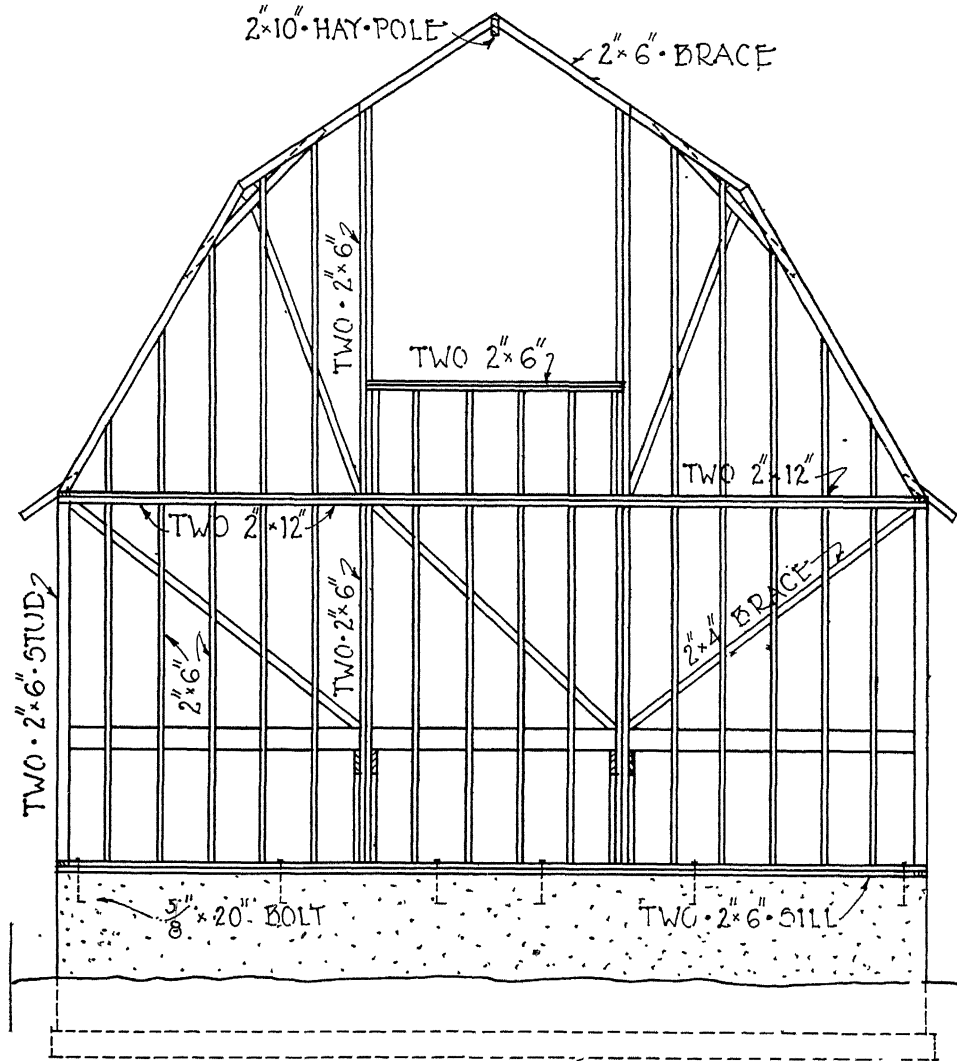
End framing for a 34-foot width. Other widths similar. Note that spacing of girder controls width of hay door opening. Studs are 24 inches on center. Plate is two 2- by 12-inch pieces. For end braces see Fig. 10. The diagonal wind braces are 2- by 4-inch pieces. No door openings are shown. These will vary according to the floor plans
